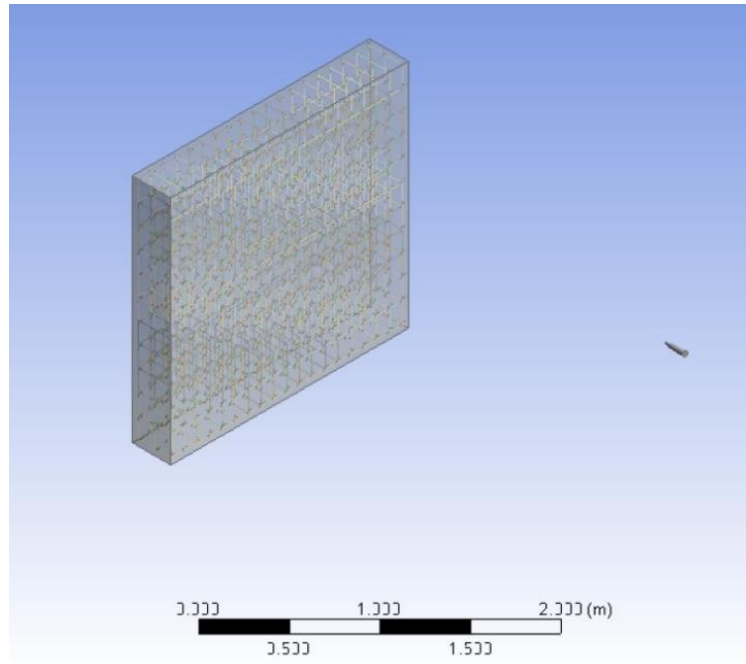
Reinforced Concrete Wall with Fragment due to 7.64 kg TNT Shaped Charge.
